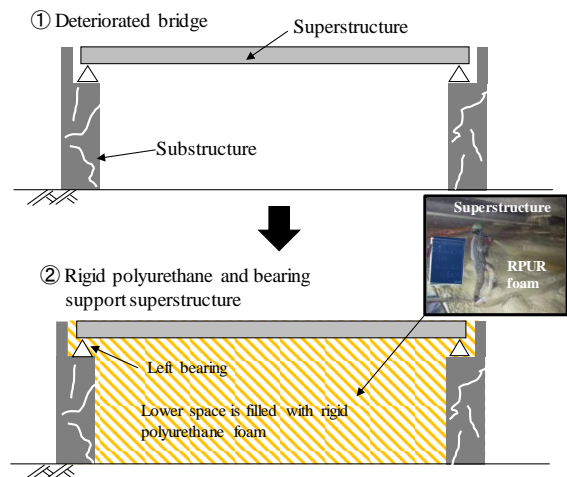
Renovation of the deteriorated bridge to lightweight embankment.
